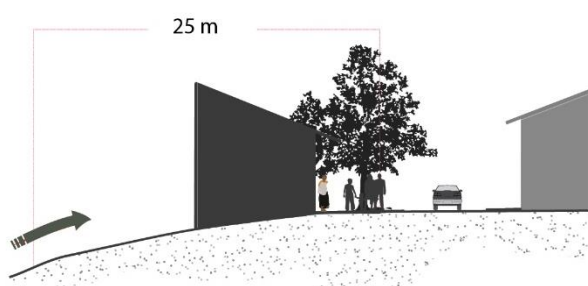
18 new built building and its topography and newly built house (from left to right)
